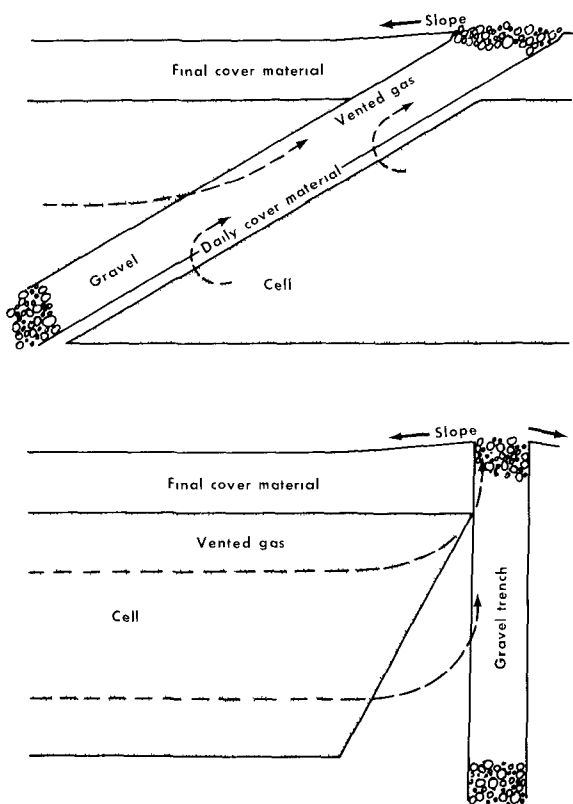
Gravel vents or gravel-filled trenches can be used to control lateral gas movement in a sanitary landfill.
